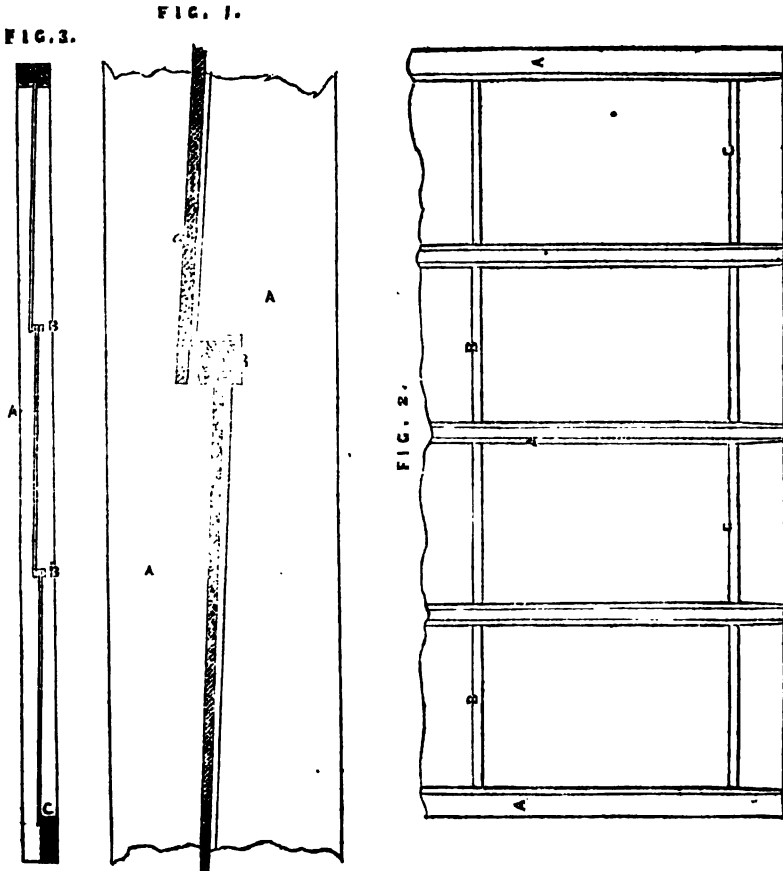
is a longitudinal section of part of a frame, on this improved plan, of the full size; fig. 2 is a plan, or a smaller scale of one-half of a complete frame, and fig. 3 is a longitudinal section of fig. 2. A A, are the styles and astragals of the frame; B B, cross-bars of thin metal into which the upper ends of the squares of glass (a) are inserted and made fast by putty, as shown in fig. 1. Each square of glass is kept at the bottom, a short distance clear of the bar,
